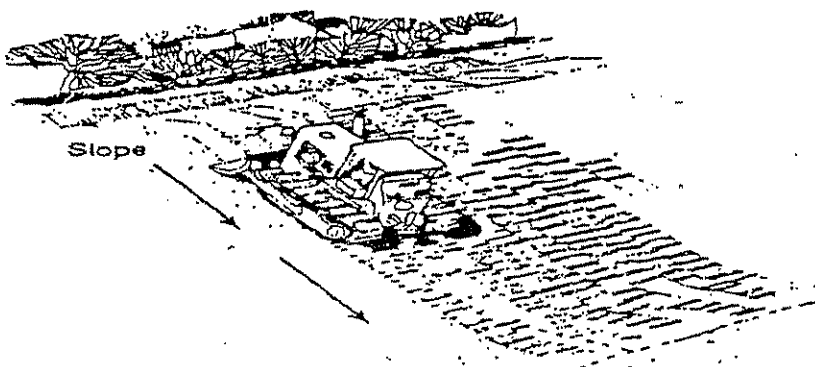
Surface Roughening with Tracked Construction Equipment
